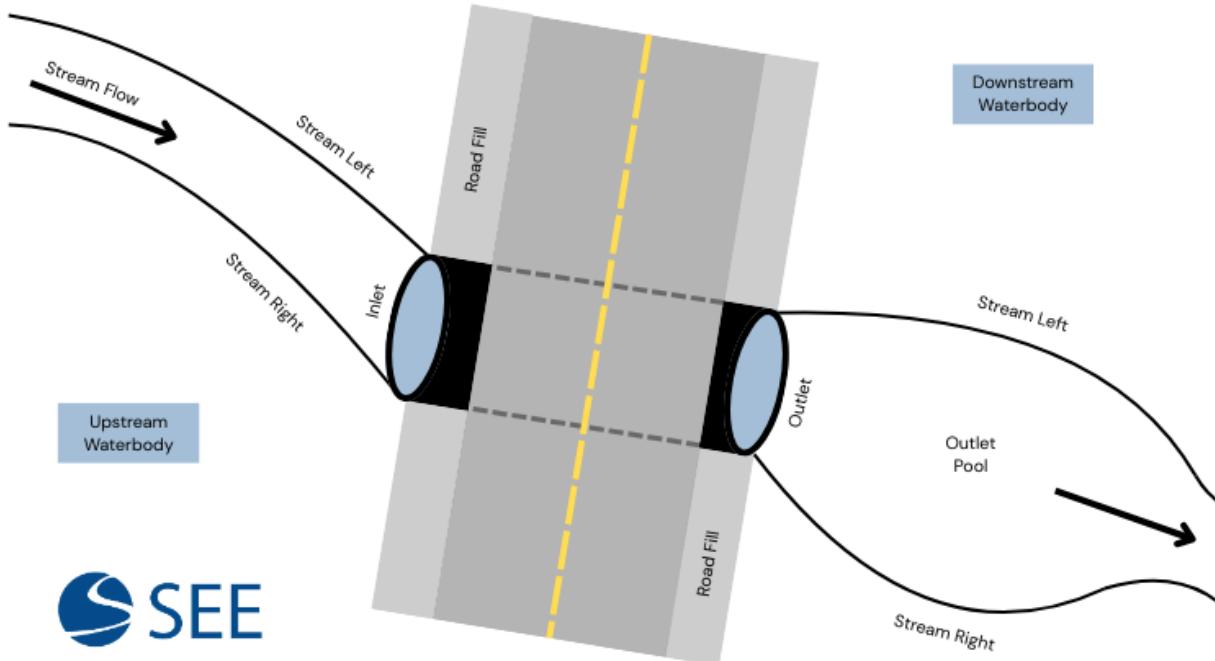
Plan view of culvert crossing terminology (NH SADES Stream Crossing Assessment 8.0, 2019).
